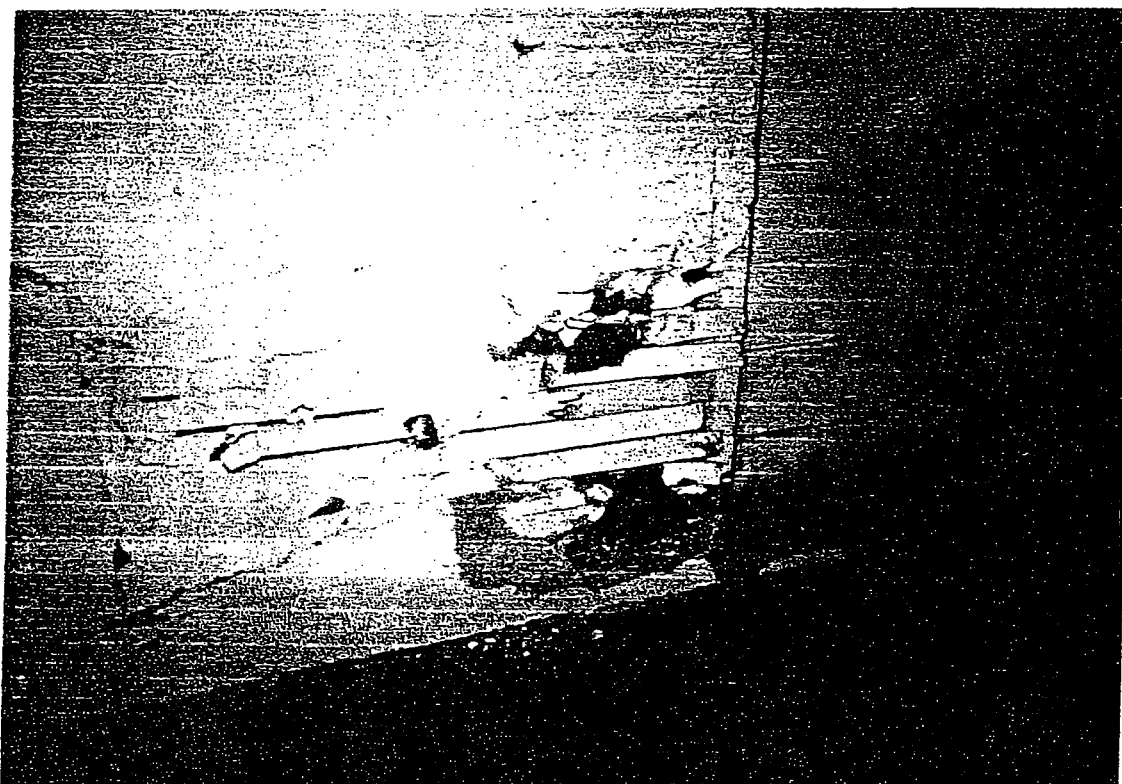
DAMAGED PLASTER WALL ON SECOND FLOOR OF
